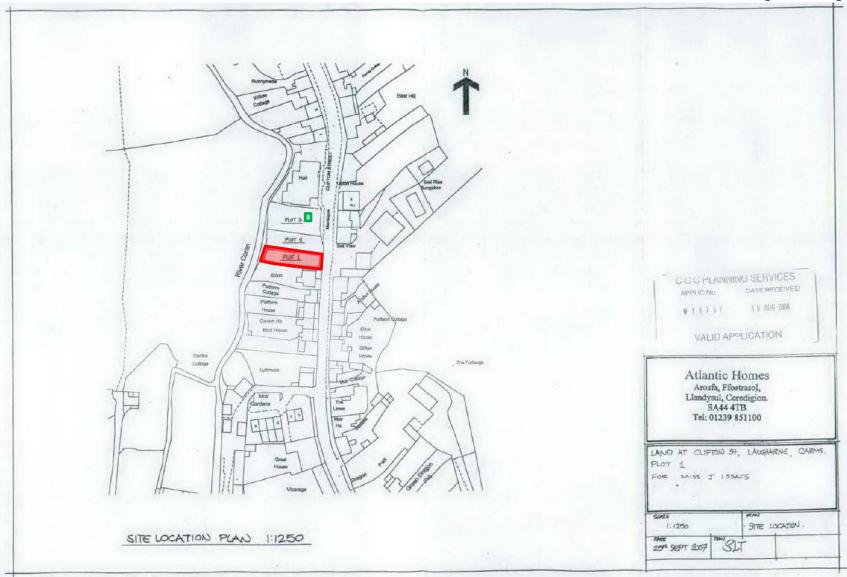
Development area for the dwelling on Plot 1 shown in red, with Tin Shed toilet in green (copied from Planning Application information on CCC Planning website).
